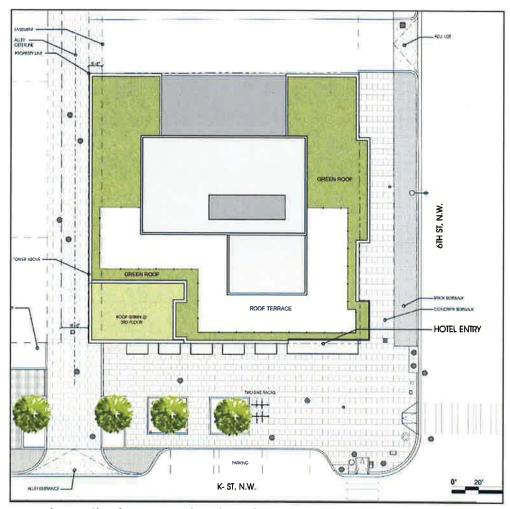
Site Plan – Proposed Conditions (Source: Fillat Architecture, 11/6/17, A007)
